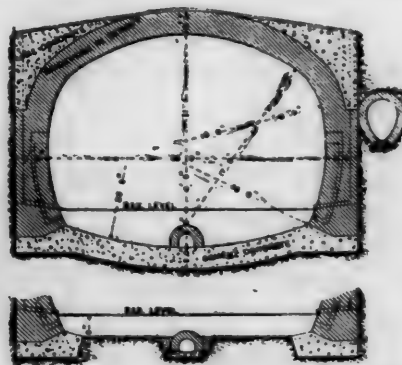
TRANSVERSE SECTION OF COVERED WAY No. 1 AND 2, WITH AND WITHOUT INVERT.
